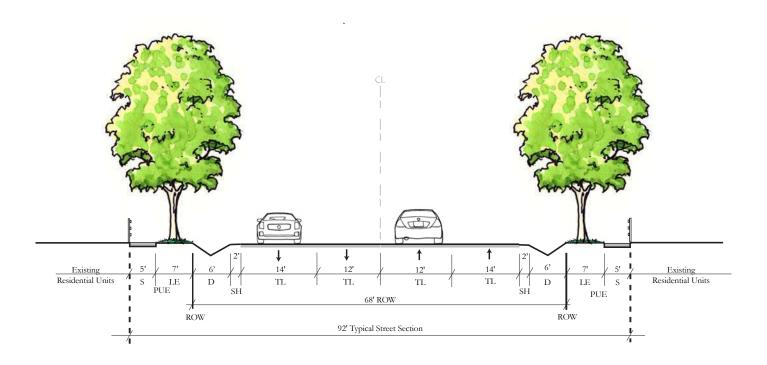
Lincoln Road Alternative (Between Sanborn Road & Harter Parkway) Section D Designation Major Arterial Right-of-Way (ROW) 68 feet 12 feet back of ditch on both sides of the street Landscape Easement (LE) Open Drainage (D) 6 feet on both sides of right-of-way Travel Lane (TL) 12 feet interior lanes; 14 feet adjacent to shoulder Public Utilities Easement (PUE) 12 feet adjacent to existing drainage (within LE) 2 feet, gravel or paved surface Shoulder (SH)
